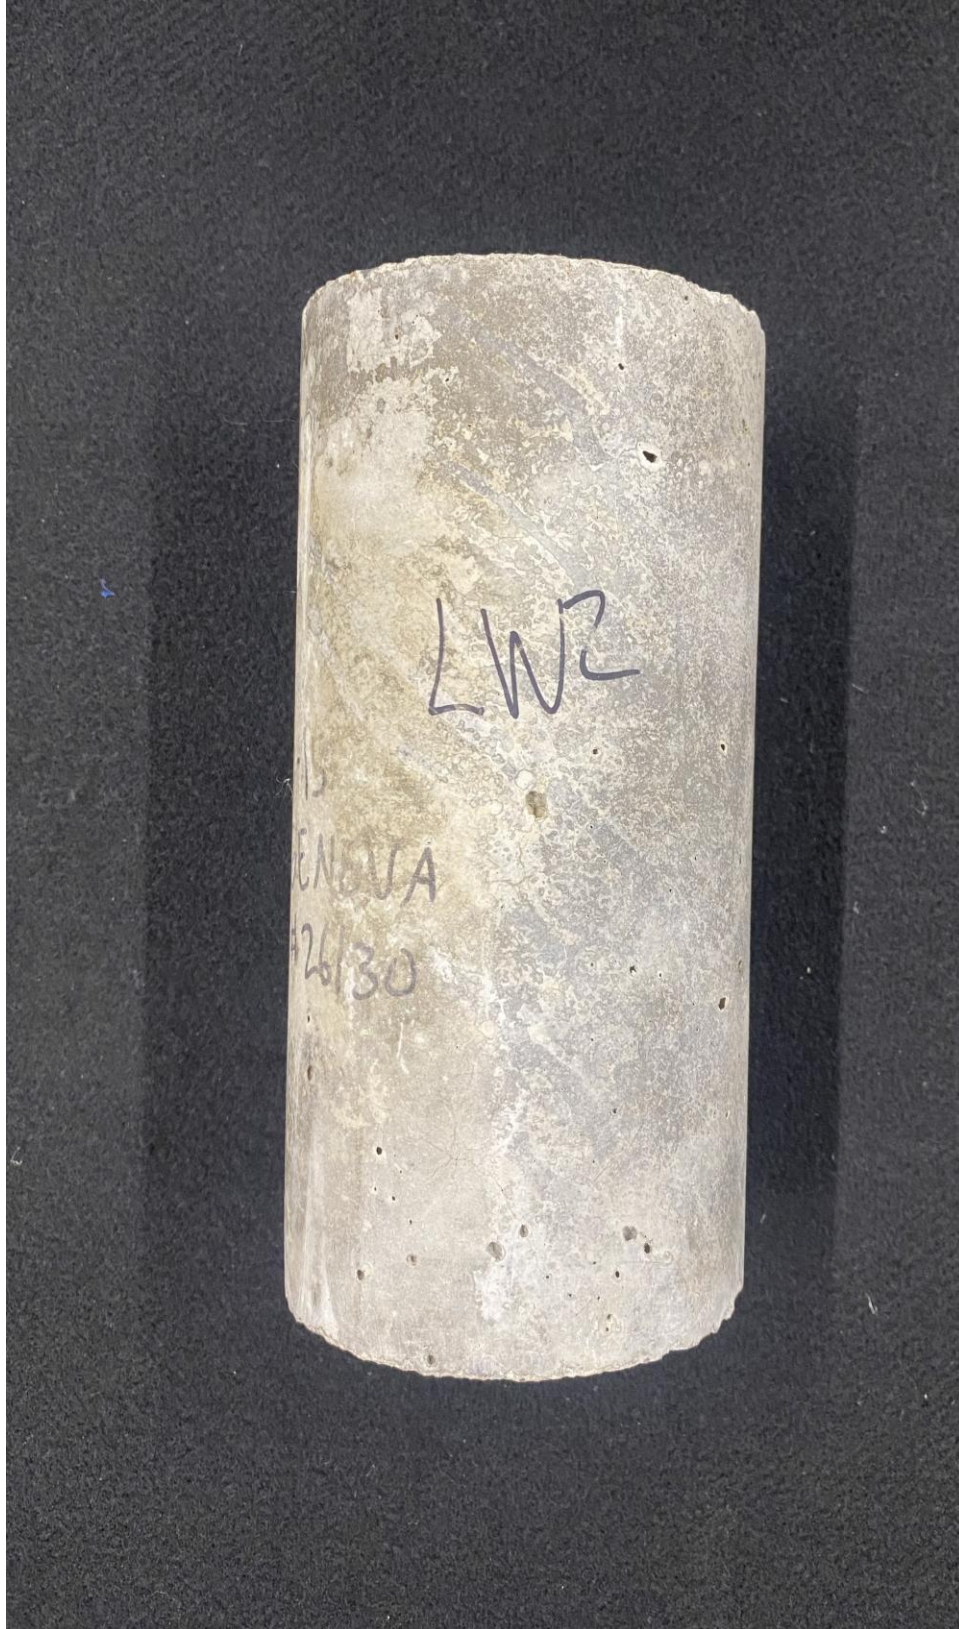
Cylinder 2 of lightweight concrete deck at bridge C-993 (after testing).
